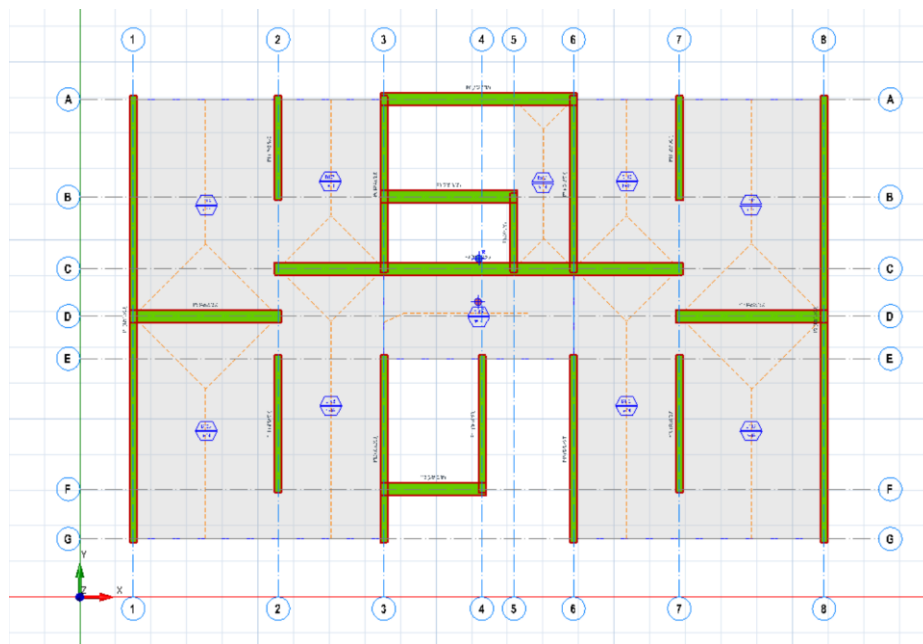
Floor Plan of RC14 Model in ProtaStructure
